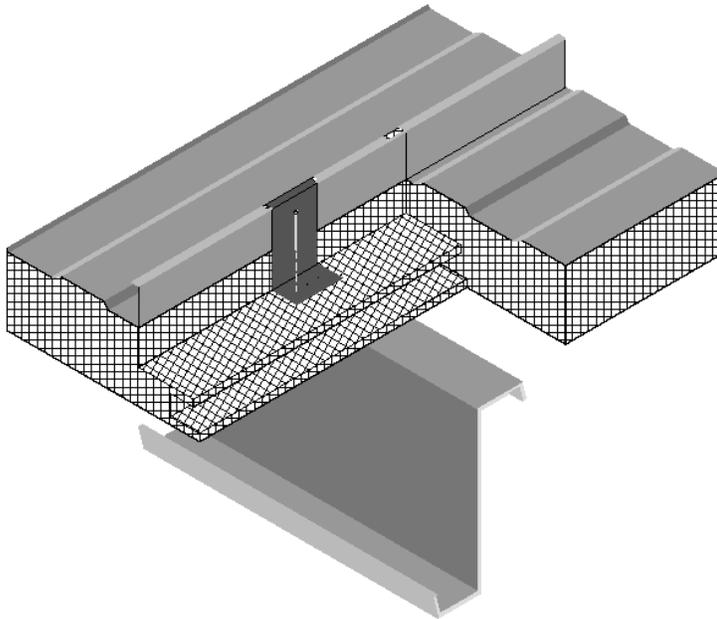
Insulated Ceiling with Removable Panels
